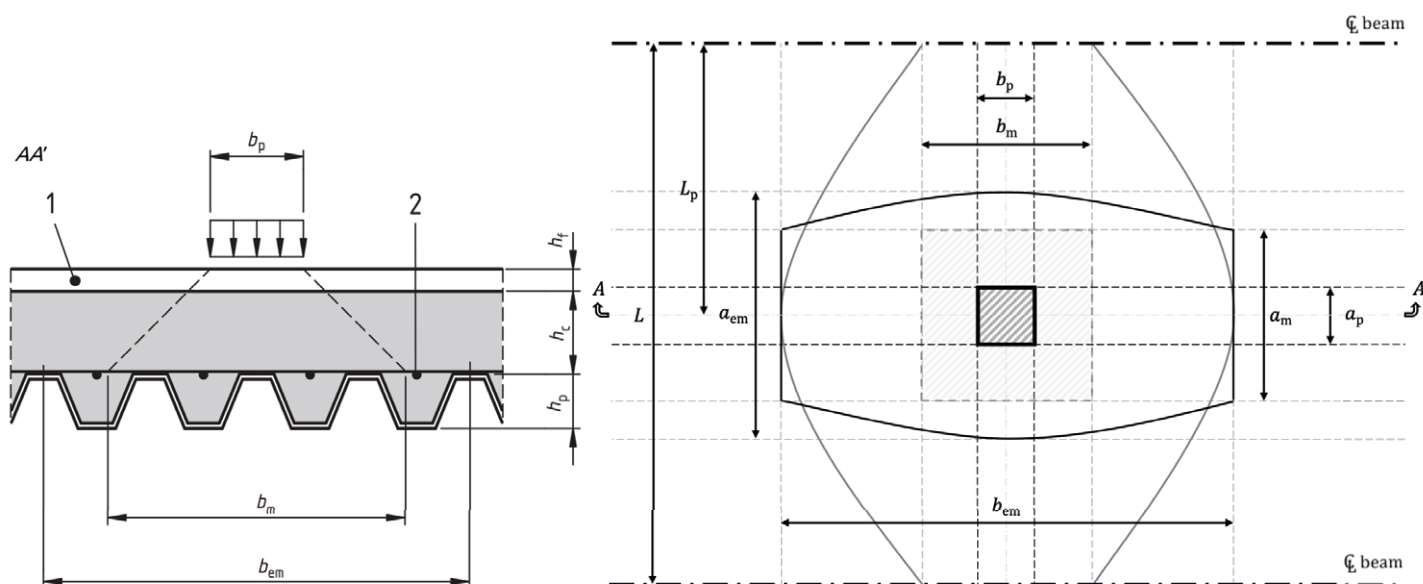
Widths associated with a concentrated load (1 indicates topping, 2 the slab reinforcement, noting that in typical UK practice it would not be placed as shown)
